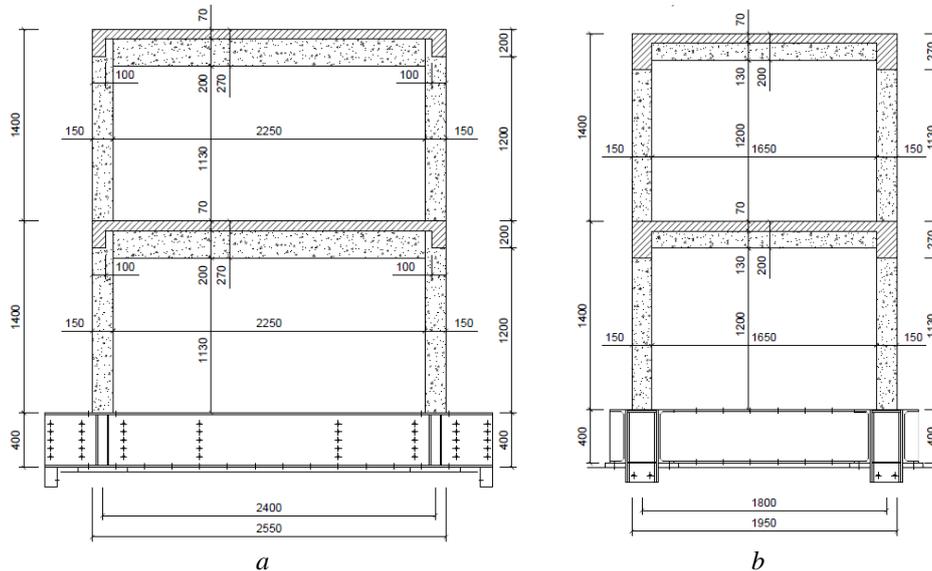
Geometry of the RC moment-resisting frame models: (a) global longitudinal section; (b) global transverse section – dimensions in mm.
